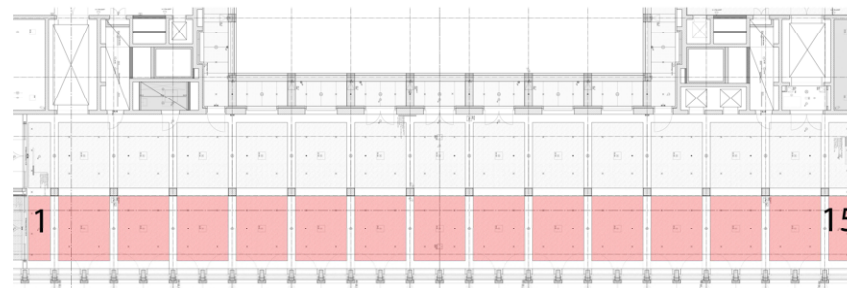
Ceiling layout with marked ceiling panels to be artistically designed,
